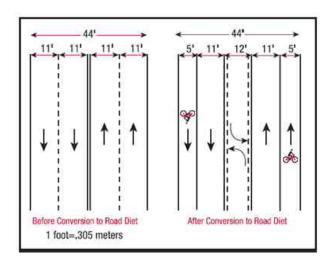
Road Diet Concept Source: Institute of Traffic Engineers
